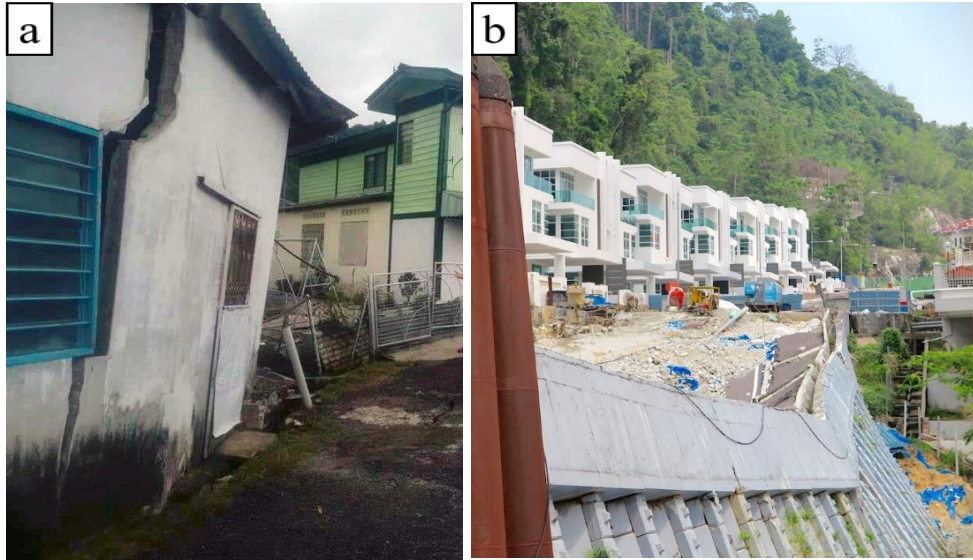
Penang homes suffer structural damage as soil sinks and roads collapse (nst.com.my).
